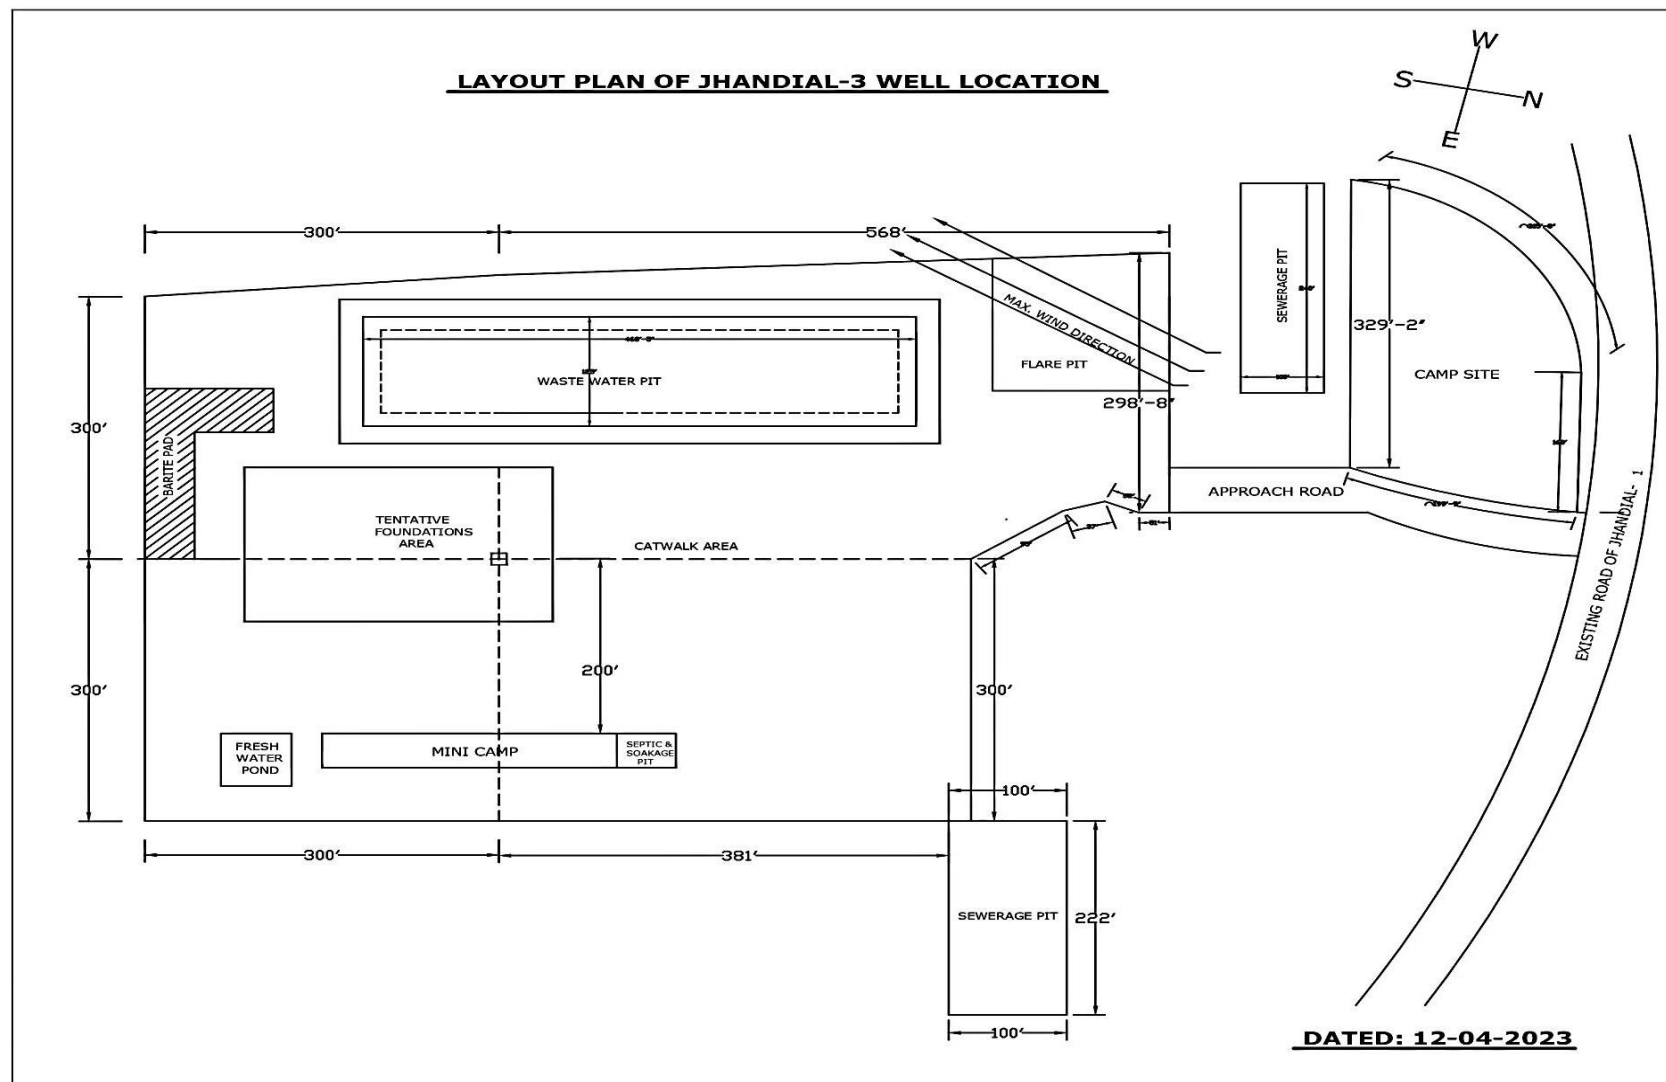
Layout Map of Jhandial -03 Well (Including Campsite, Wastewater Pit, Flare Pit and Access Road)
